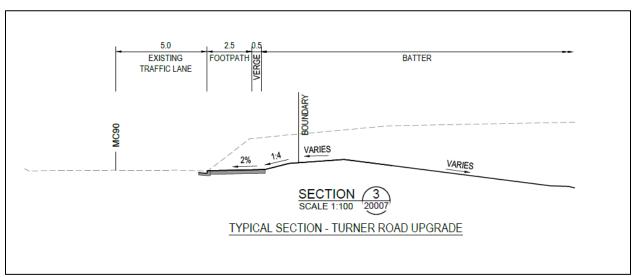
Typical Road Cross Section (Source: ARUP, 2024)
